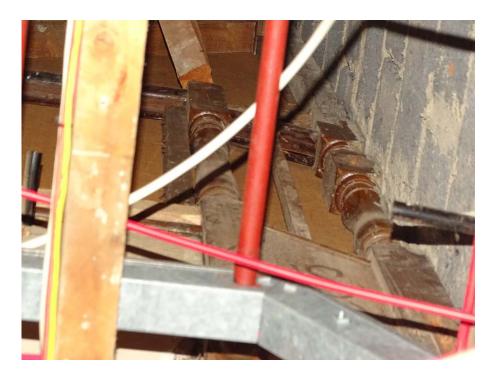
Staircase behind suspended ceiling in the ground floor of the House
